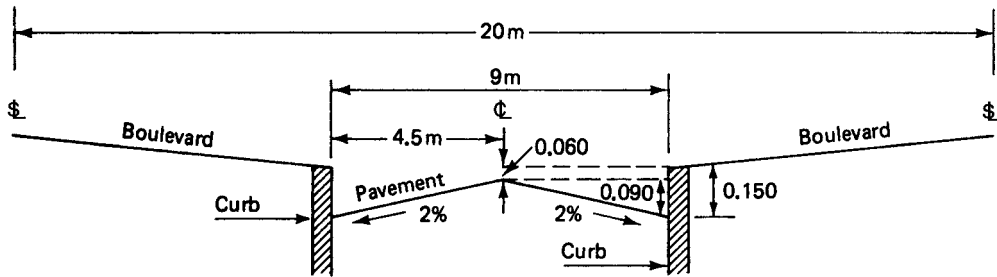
Cross section showing the relationship between the centerline and the top of the curb elevations.
